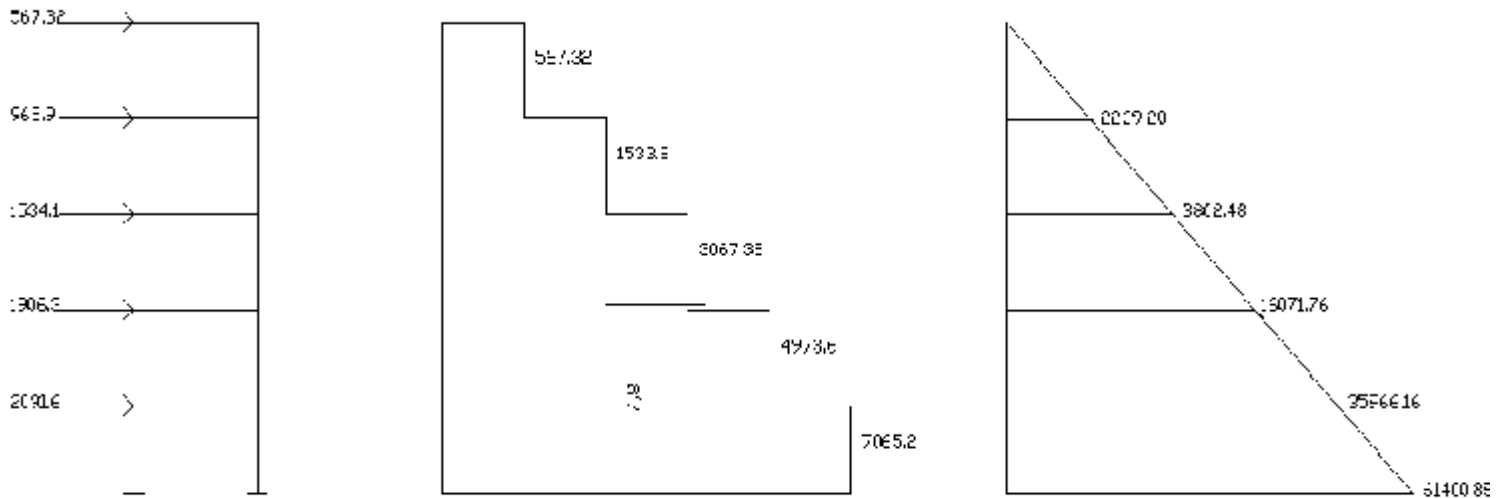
Shear & Moment Diagram for Shear Wall
